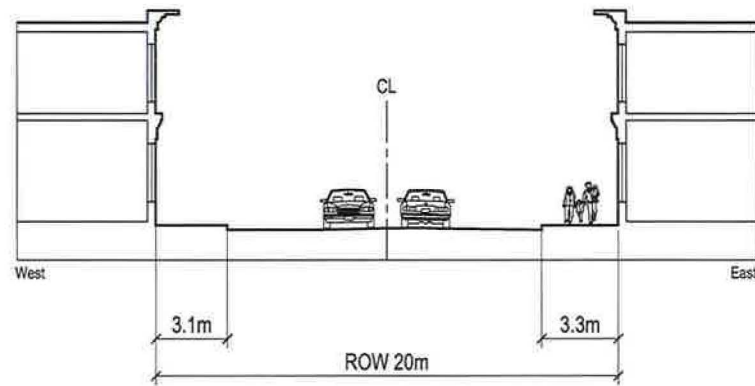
Proposed Section - Main Street at Intersection of Main and Ferry
